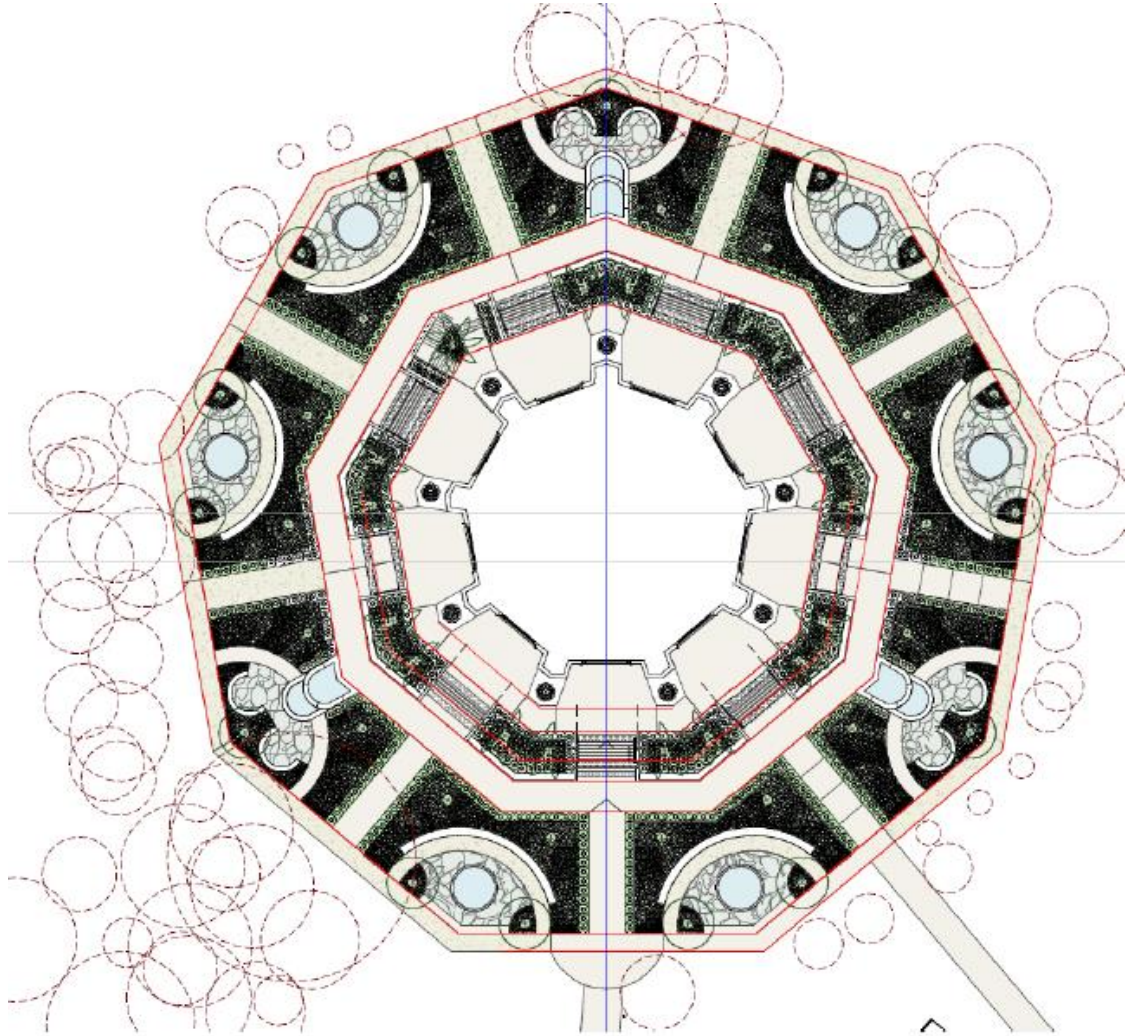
Figure A – excerpt from the DA plans showing an overview of the proposed landscaping works within the building's existing curtilage
